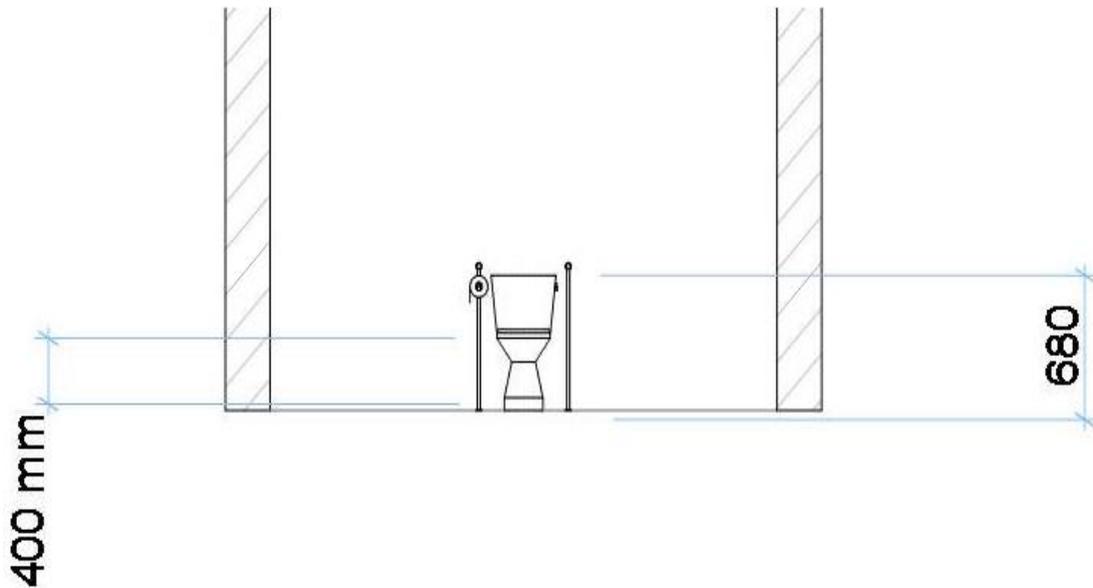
Dimensions for floor mounted toilet and grab bars
